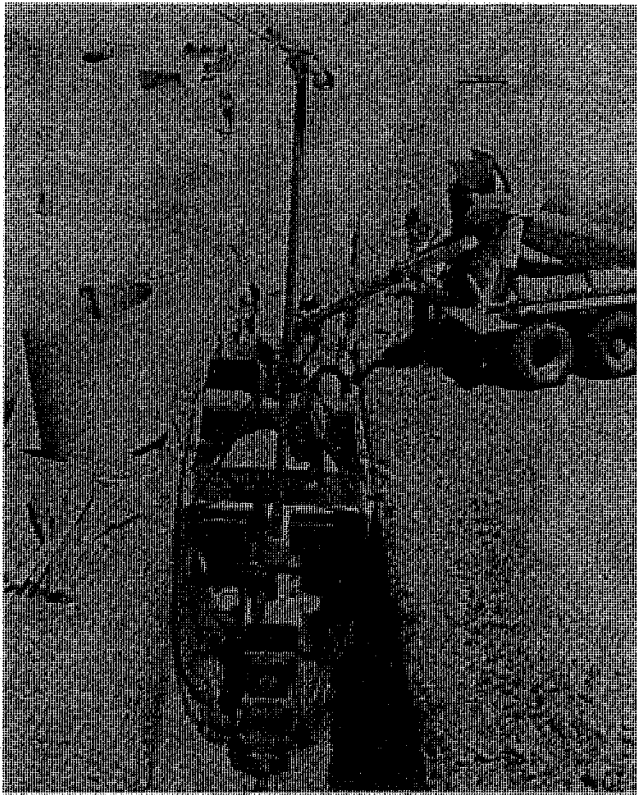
Single-stage construction using metal forms. Front view of 84 in. (2135 mm) diameter machine. Power unit and winch are mounted on front of machine. Large metal forms are lowered into place by machine mounted boom as concrete is fed into the hopper.
